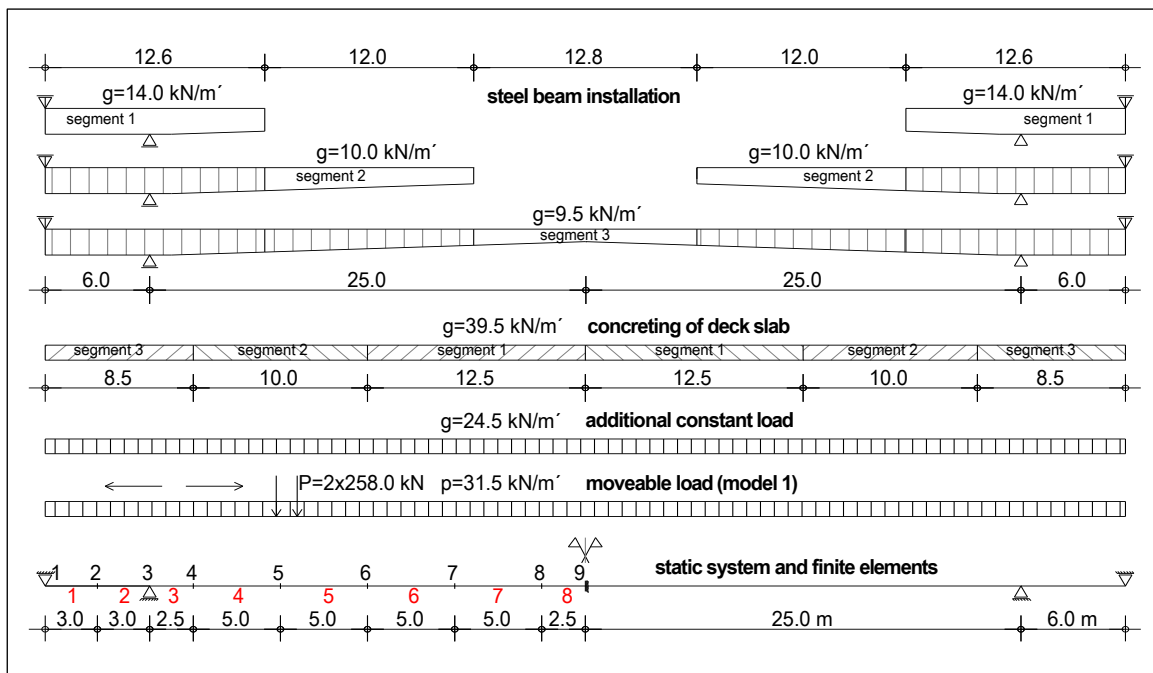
Phases of steel beam installation and slab casting, additional dead and live loads, static system, and finite elements
